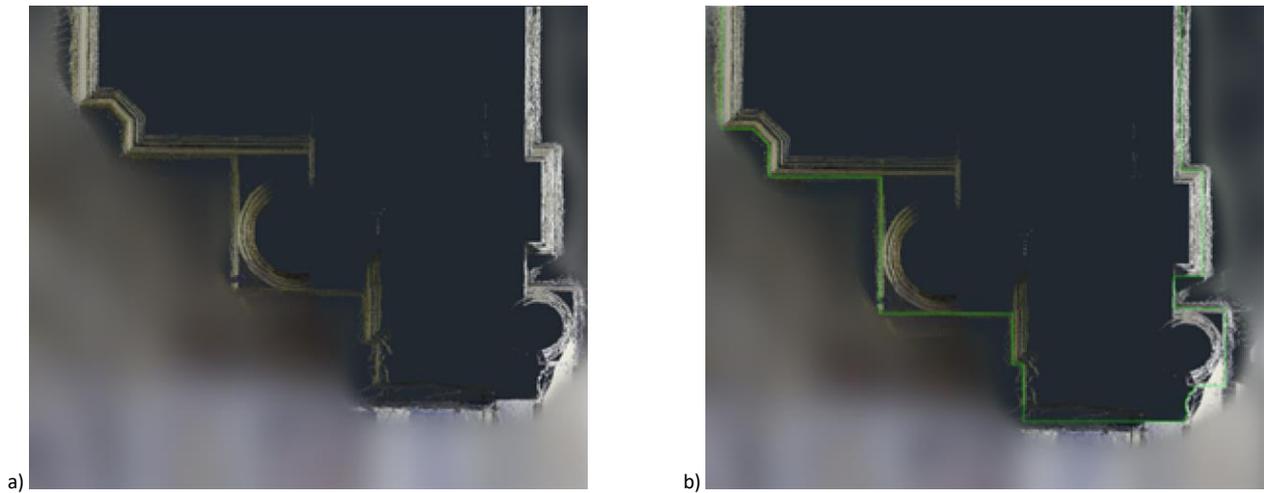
Top view of the sliced points cloud. a) Detail of a 2-meter-high section of the points cloud. b) Floor plan (in green) drawn considering the maximum dimensions on the floor.
